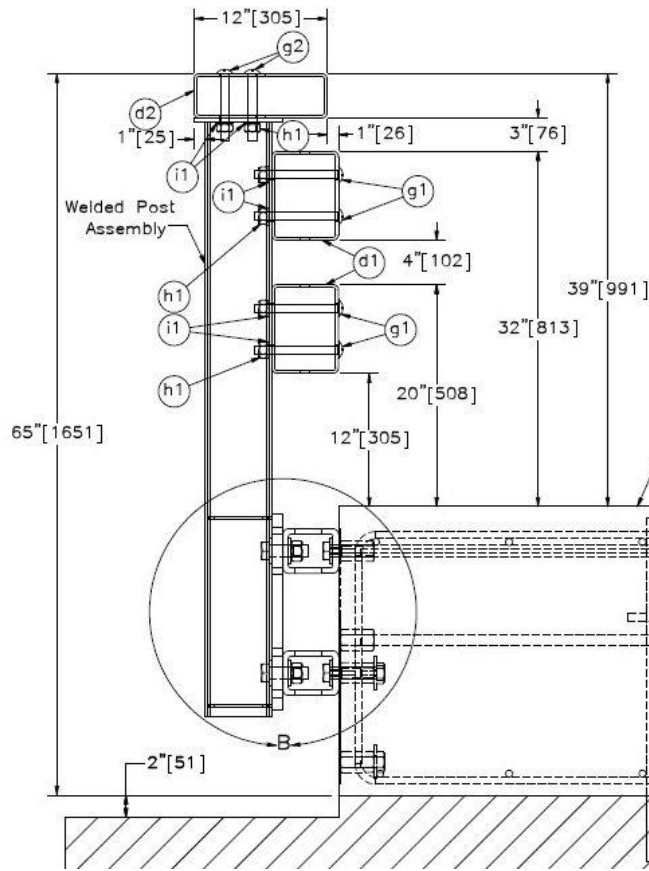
39-in. Tall Illinois-Ohio Steel Bridge Rail Drawing [29-32]
